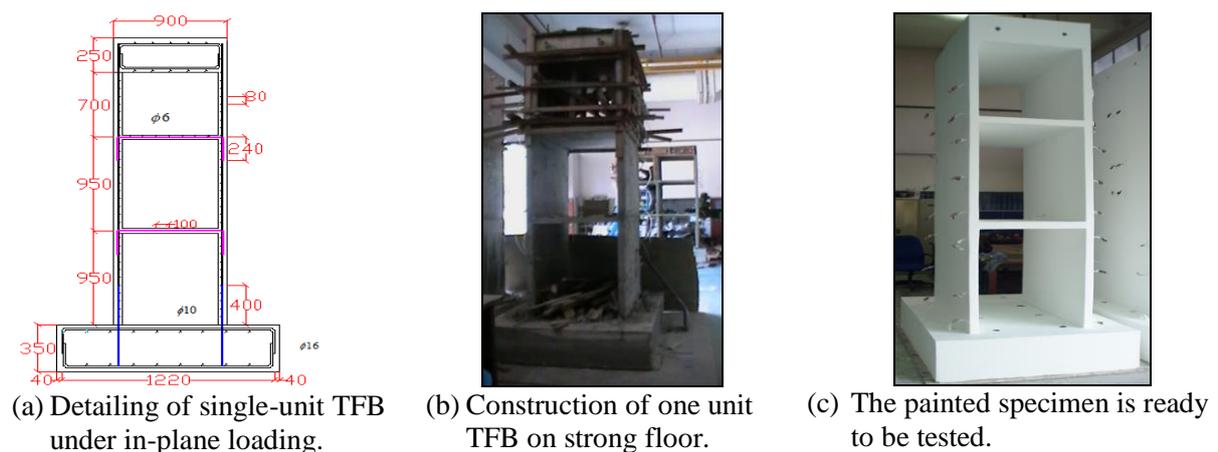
The detailing and construction of one unit TFB in heavy structural laboratory
